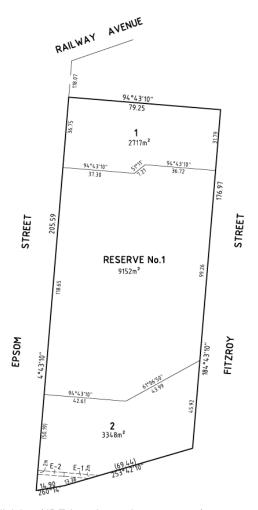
Proposed Plan of Subdivision (JREdwards, 23 January 2024)
